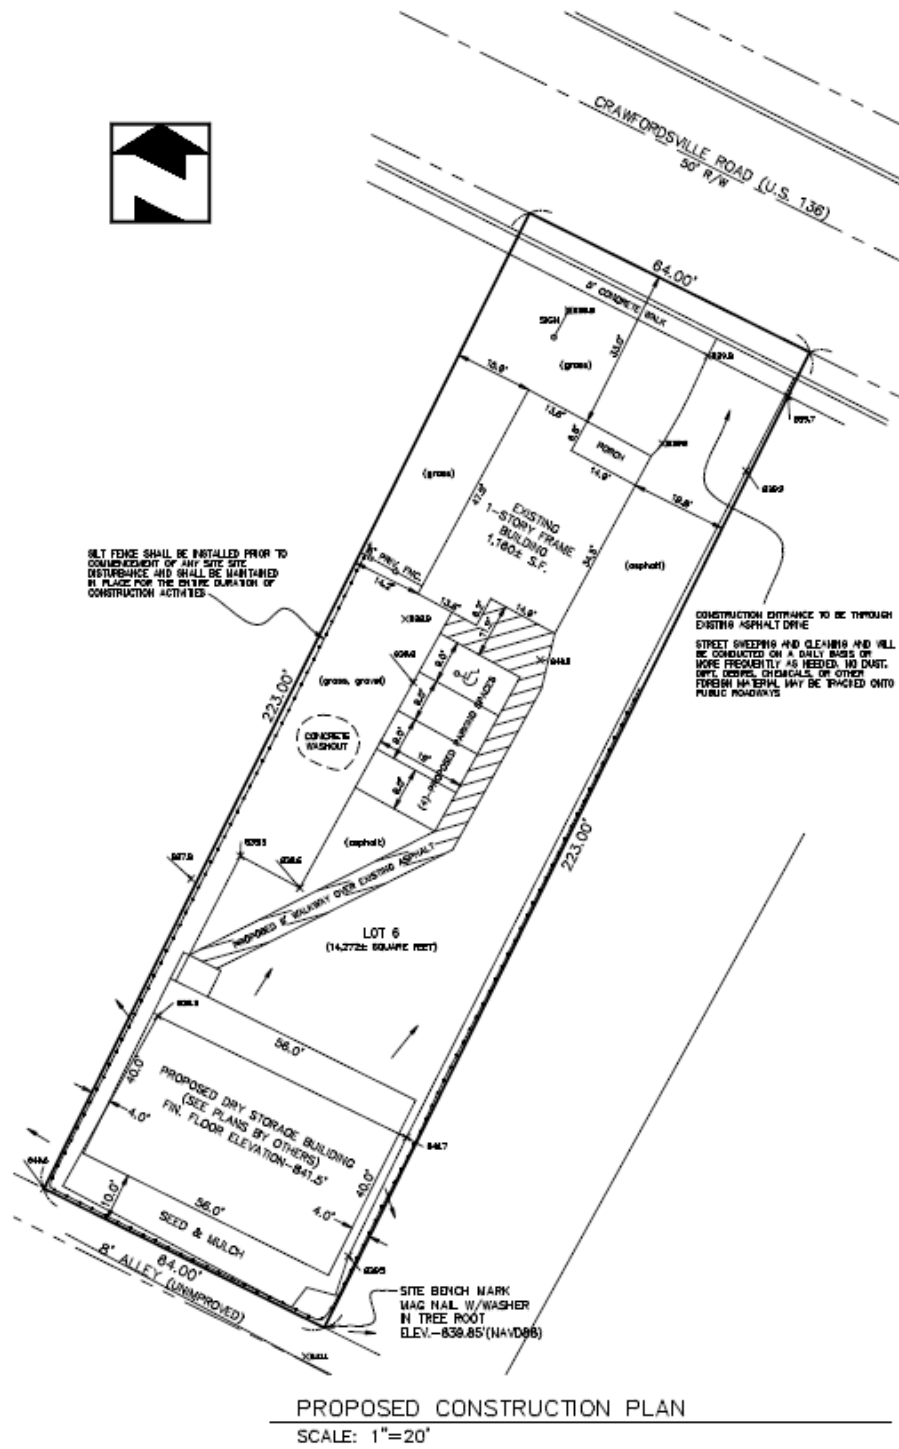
Site Plan for 9111 Crawfordsville, if variance of use is approved.
